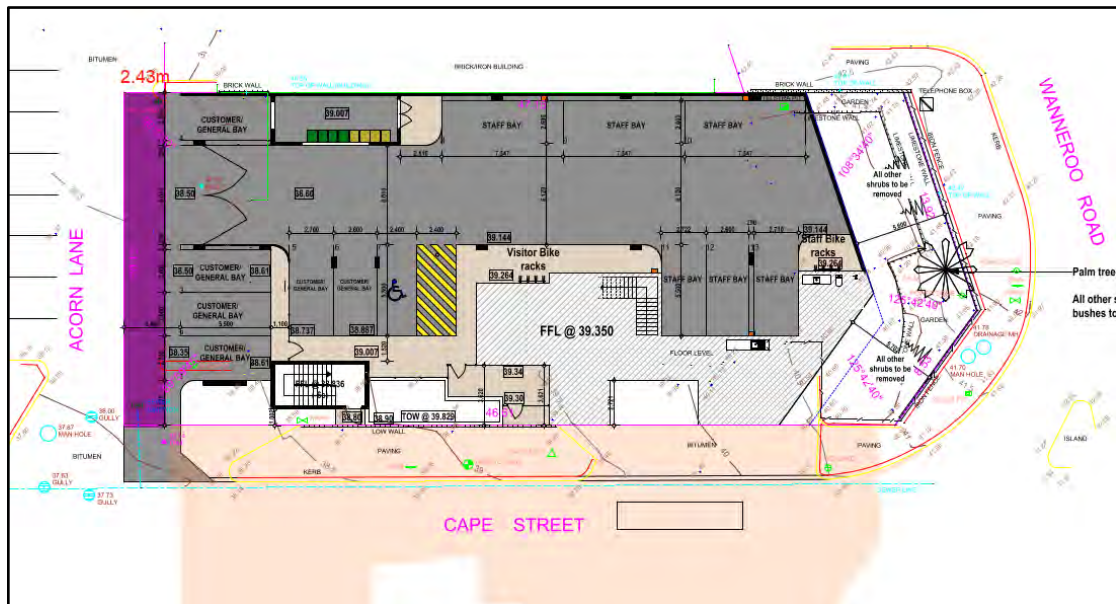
Annotated 2.43m Acorn Lane Road Widening Area (in purple)
